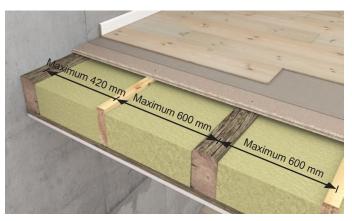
Older floor slabs constructed with an extra beam between the existing floor joists to reduce the span to a maximum of 600 mm. Alternatively, the floor slab can be reinforced, see *Fact sheet #1 Reinforcement of older floor slabs*, at kronospan-dk.dk.
